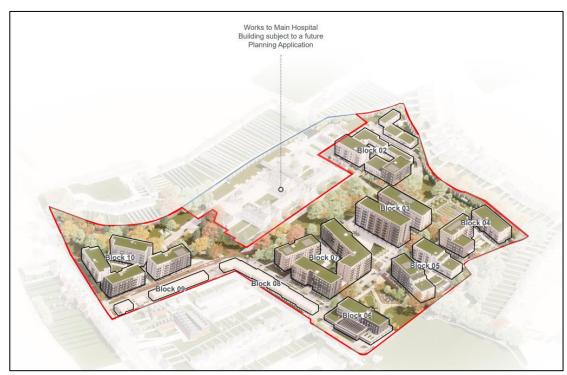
Extract from Reddy Architecture and Urbanism's *Architectural Design Report* showing the proposed site layout. (Source: RAU 2024.)
